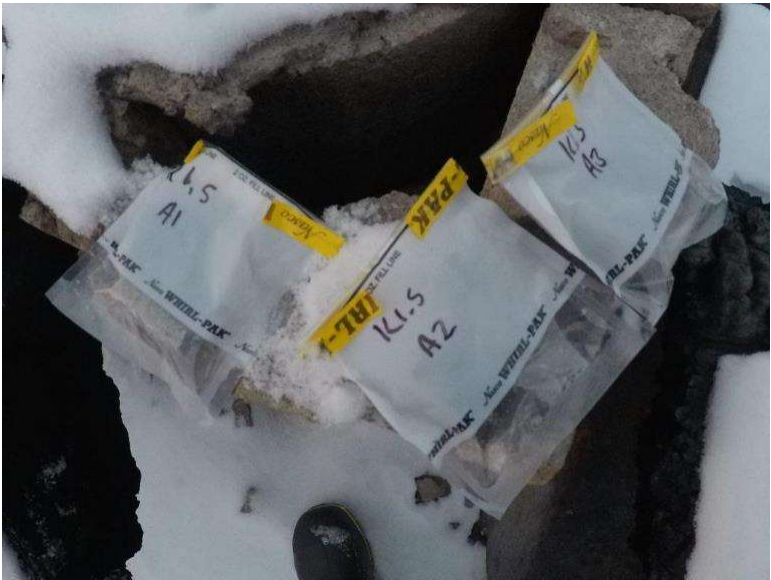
Site 1.4 Crandell Campground Washroom 2
